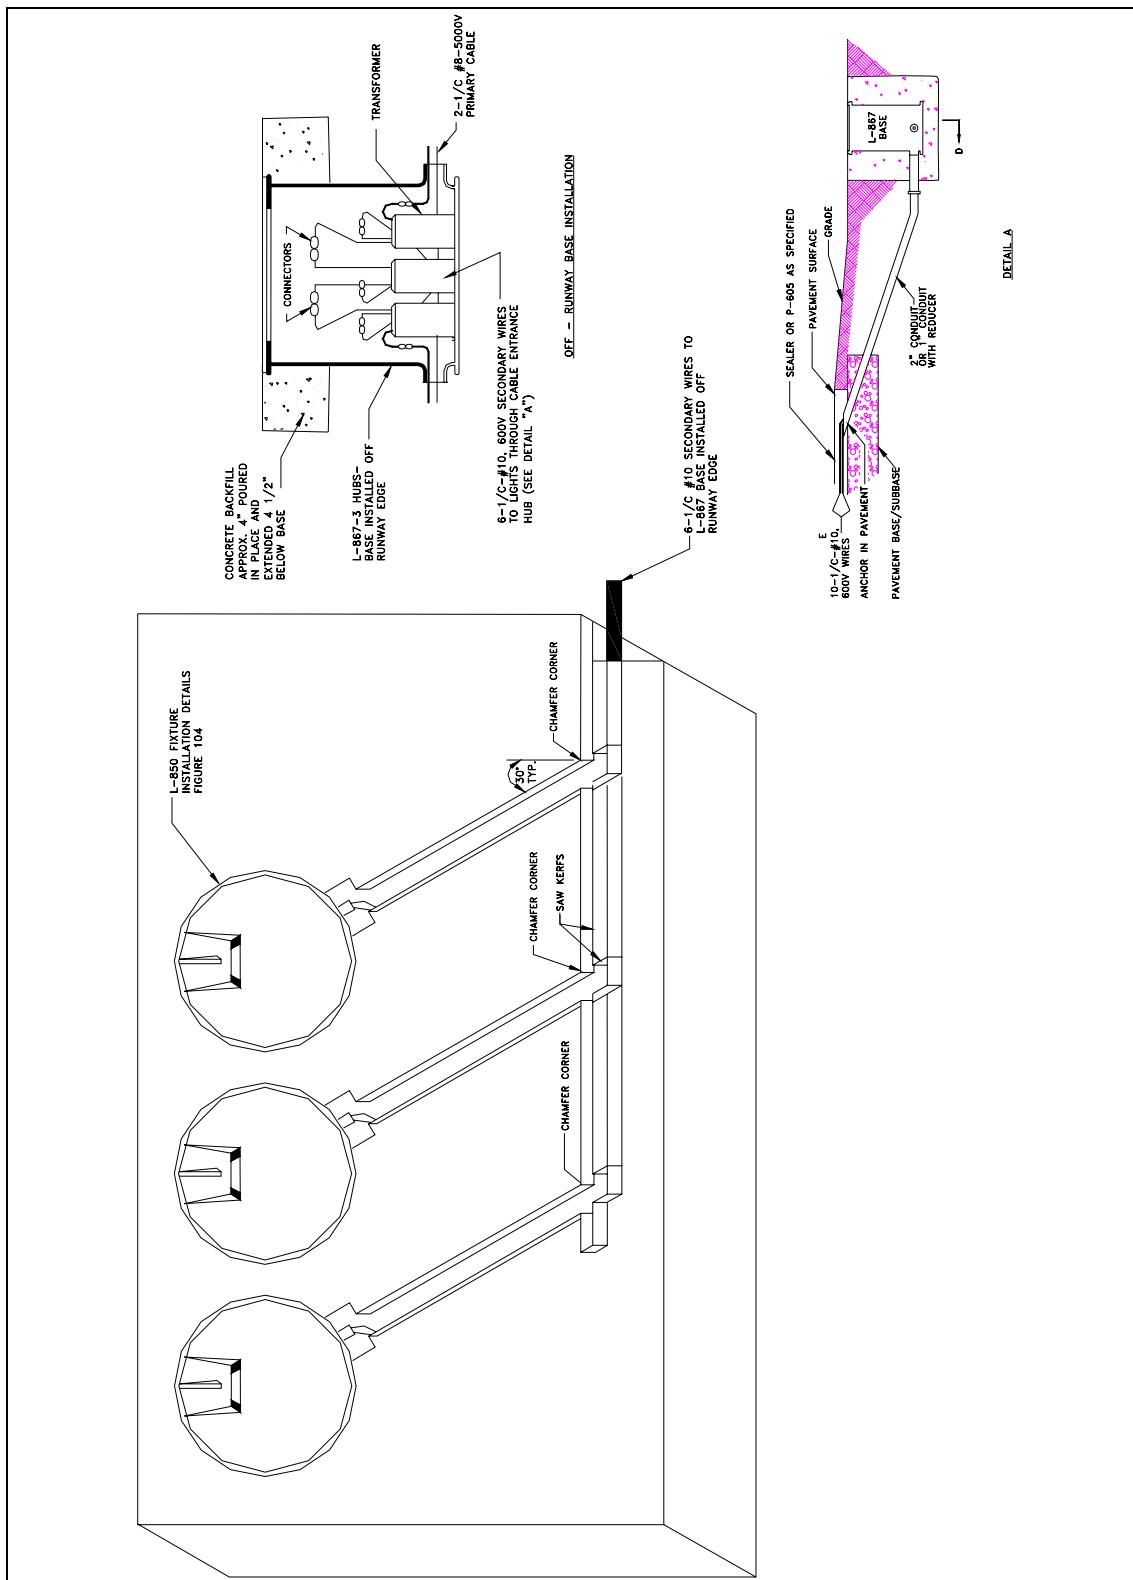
Typical Equipment Layout, Inset Type Lighting Fixtures
